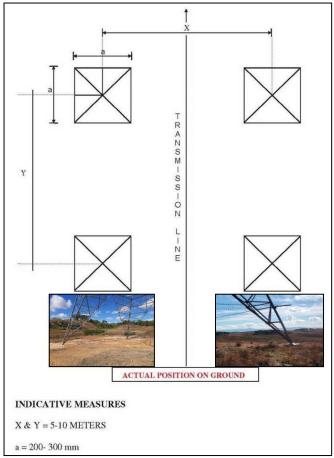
Typical Plan of Transmission Line Tower Footing Showing actual Ground Position and Extent of Impact
